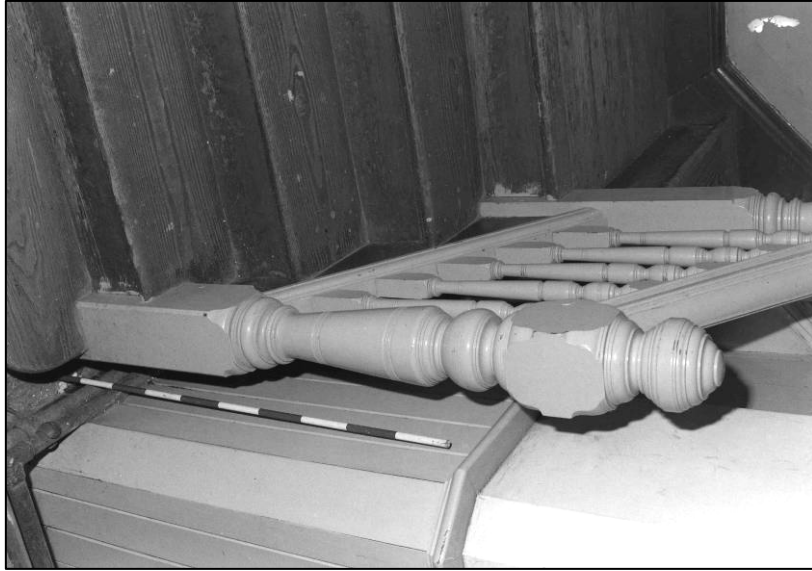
School: GF, newel to stair, looking E (photo 12/6) (top to right).
